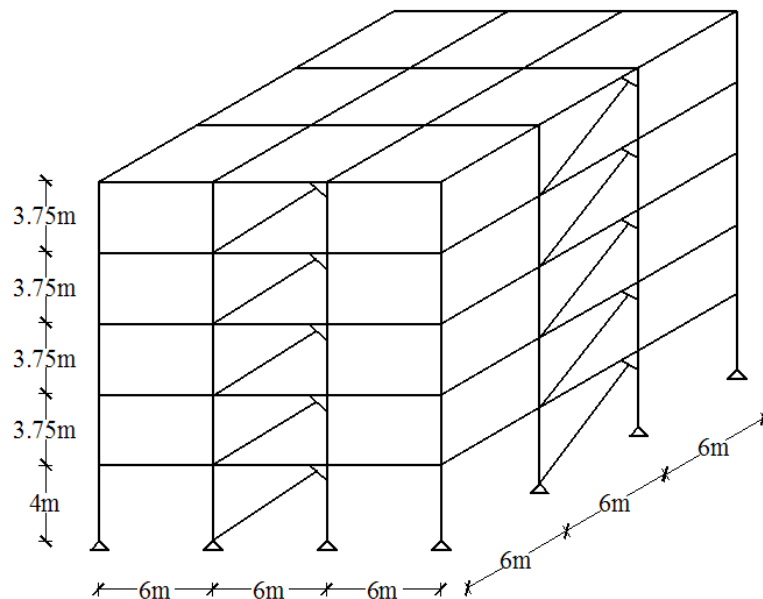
Symmetrical Plan and Section central bay knee bracing.
